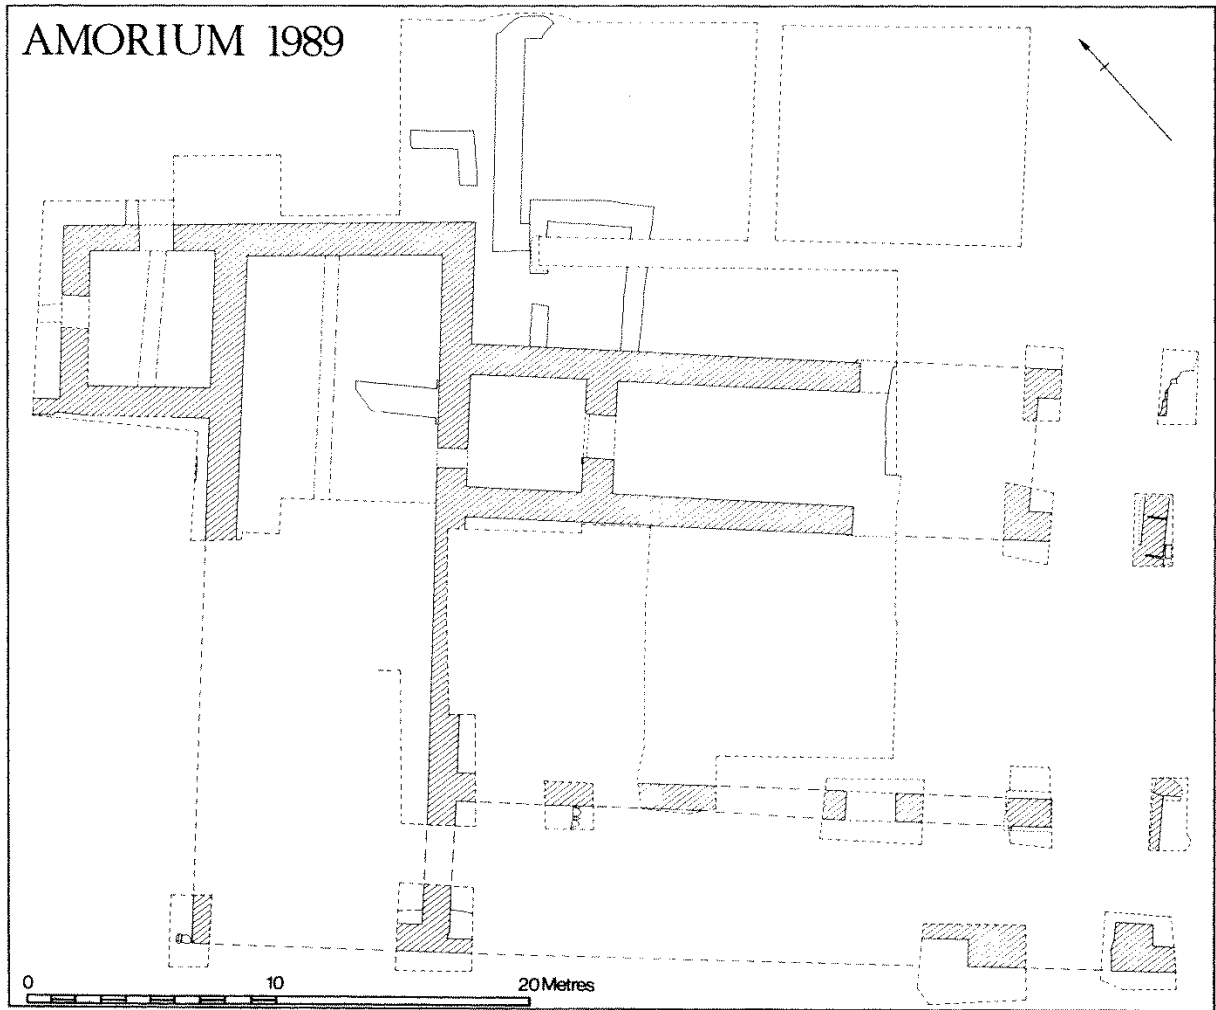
Plan of one of the excavation trenches. Large Late Roman Building. (After Harrison 1990, p. 210, fig. 3).
